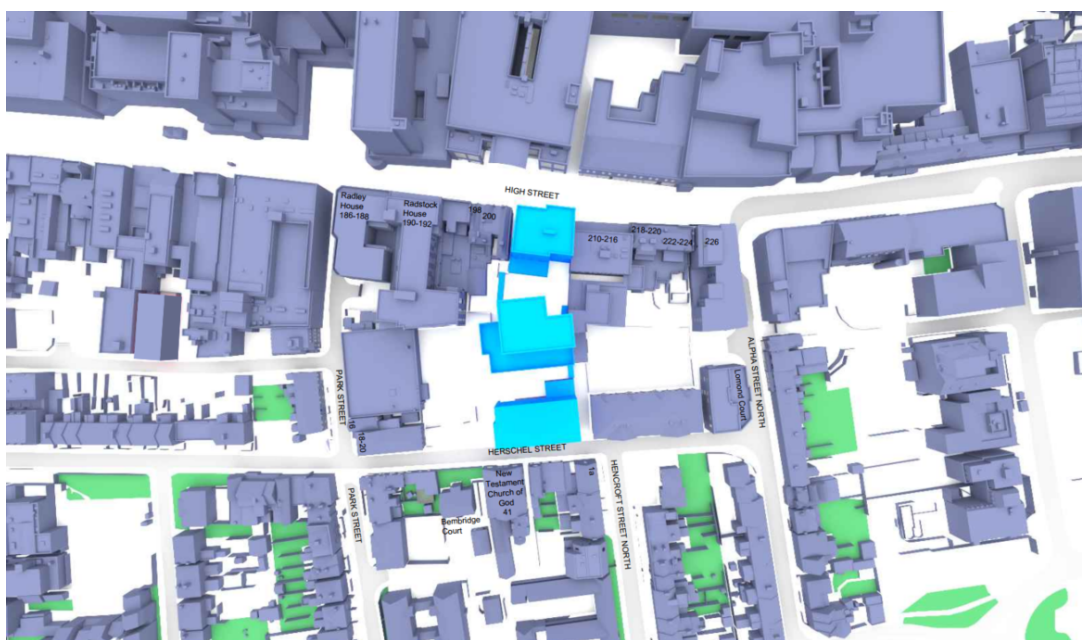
Extract of Proposed Plan and Neighbouring Sites
